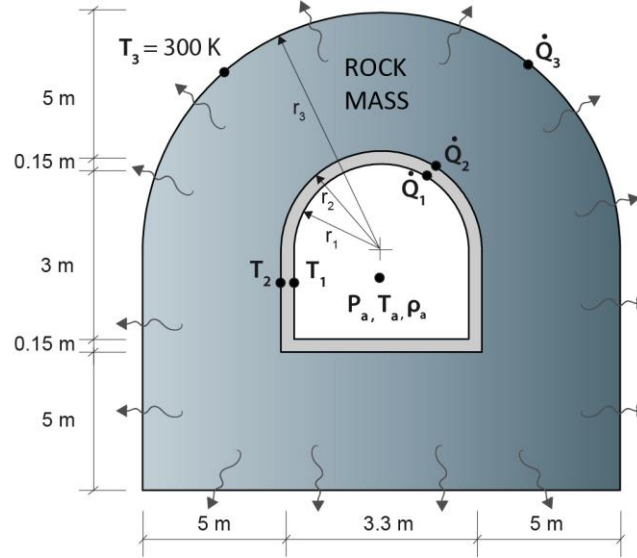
Cross-sectional area of the underground reservoir with a 15 cm thick reinforced concrete lining.
